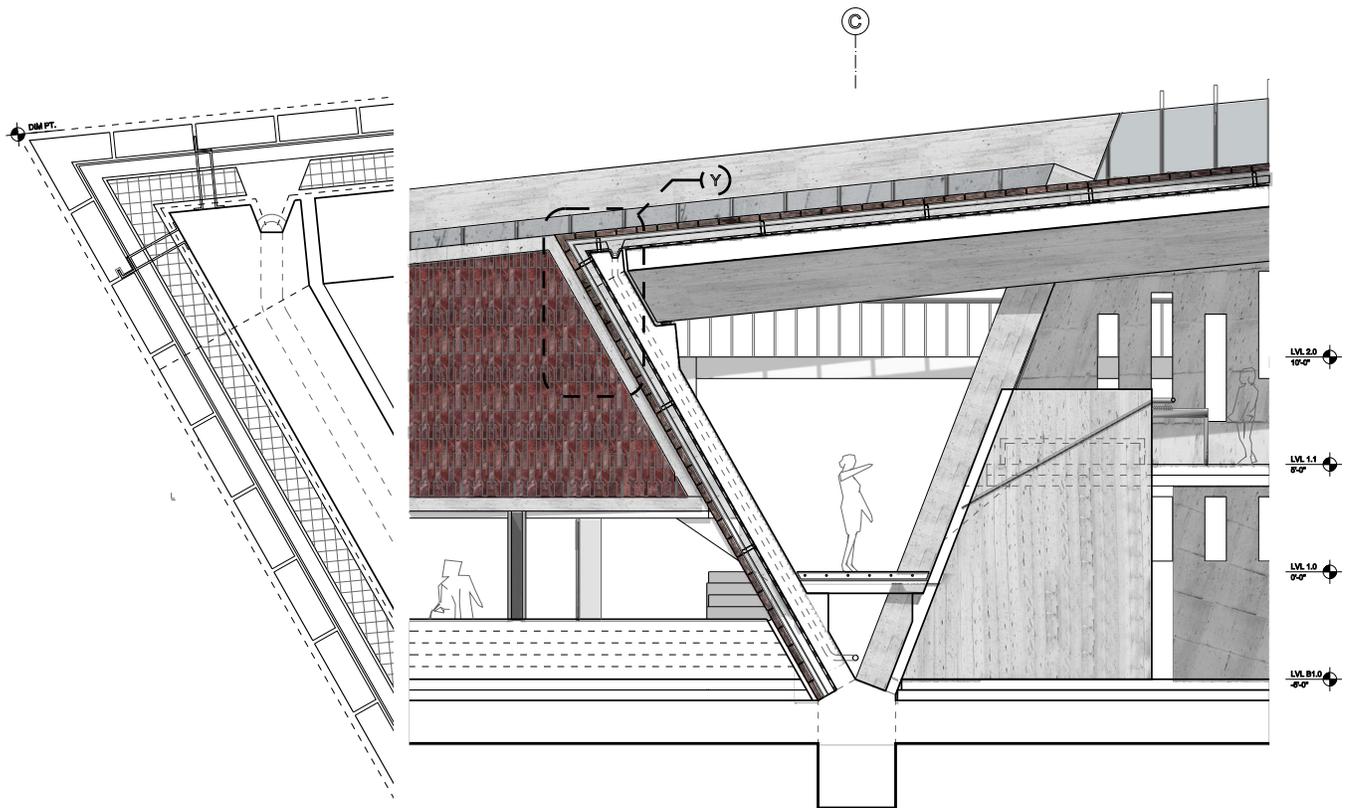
// Ribbon Wall Section + Corner Detail (Y) // By Ian
